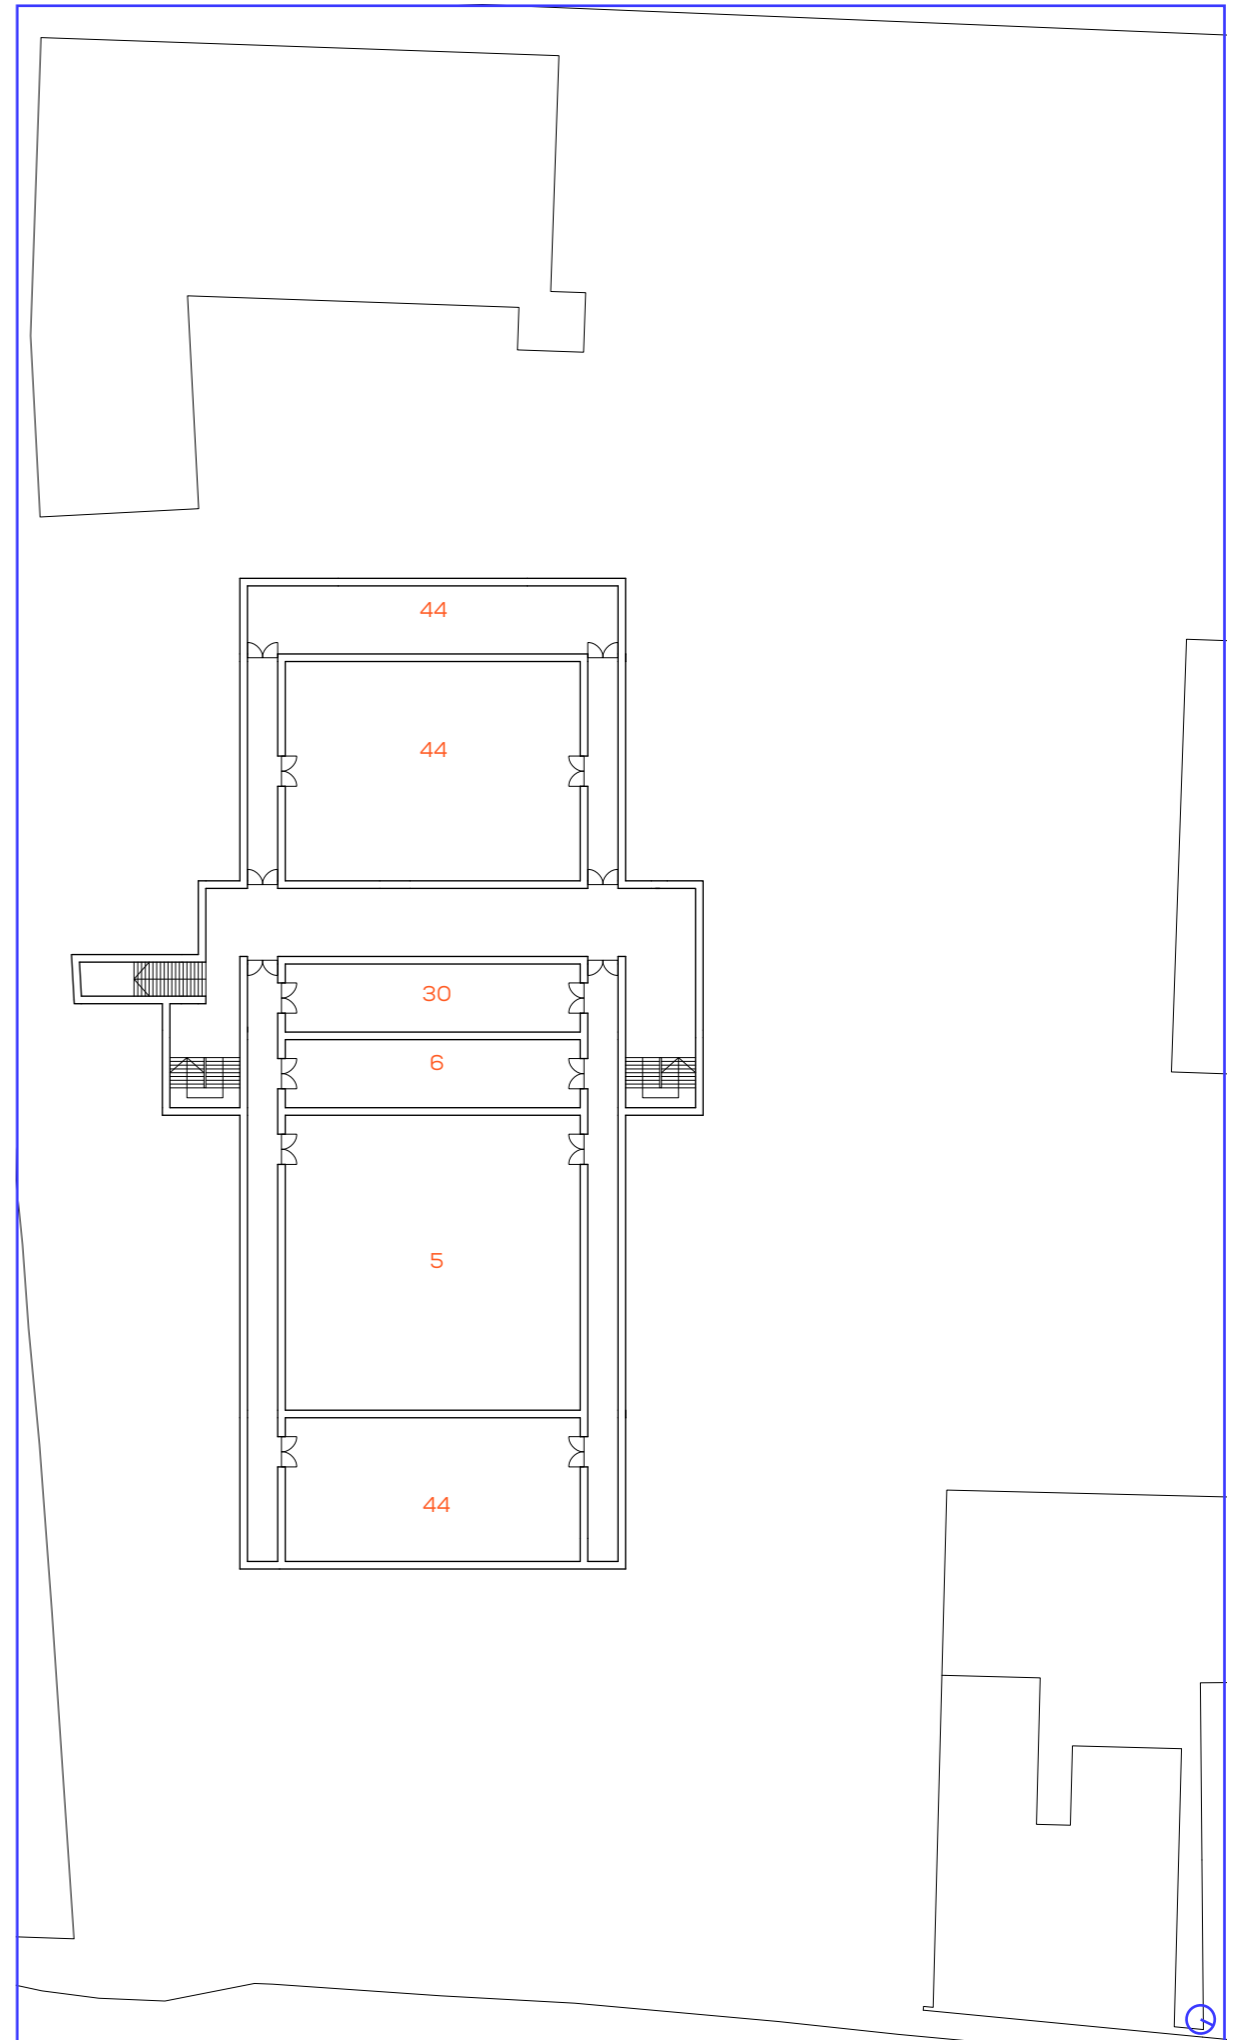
Floorplan basement drawn on scale 1:200, scaled to 1:400
